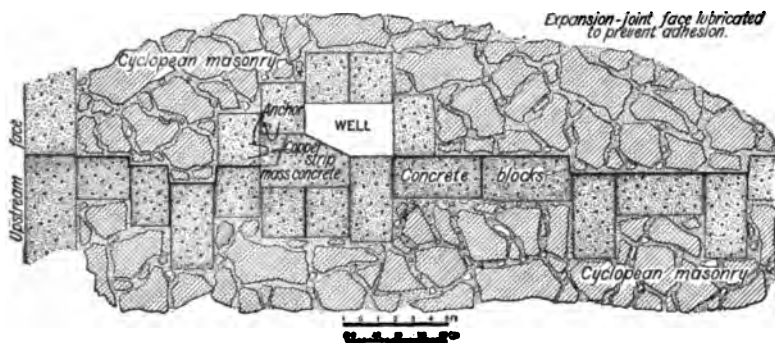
Transverse Expansion Joint in Olive Bridge Dam, Showing Drainage Wells.
